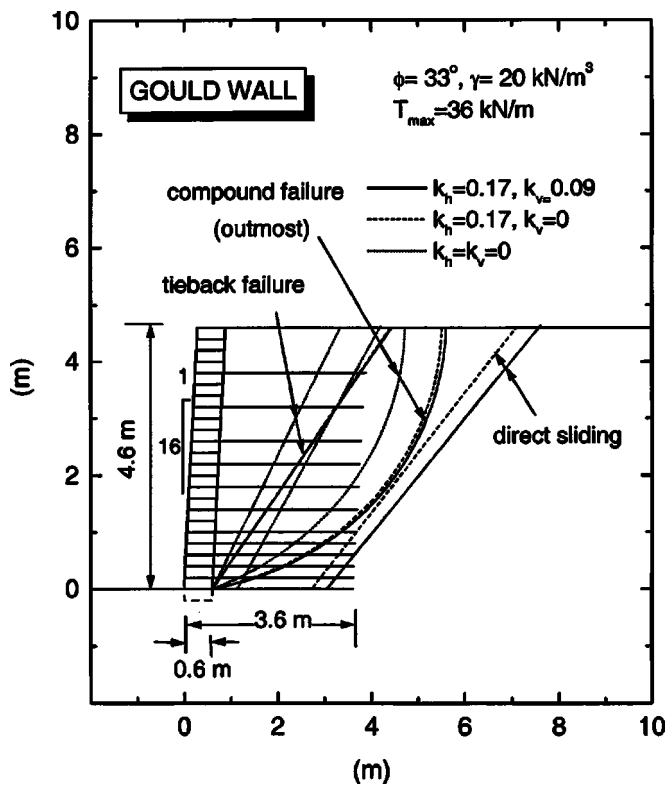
Geometry and associated failure surfaces for Gould Wall under static and seismic conditions
